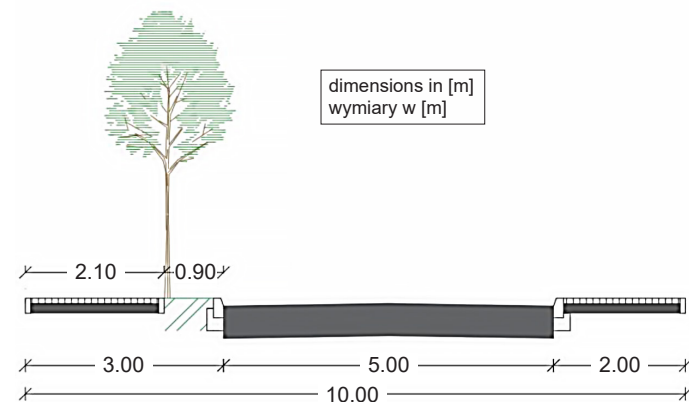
Typical cross-section of a two-way street with sidewalks developed from the book by Arthur Antoni Kühnel Eng. 1925 [16]
